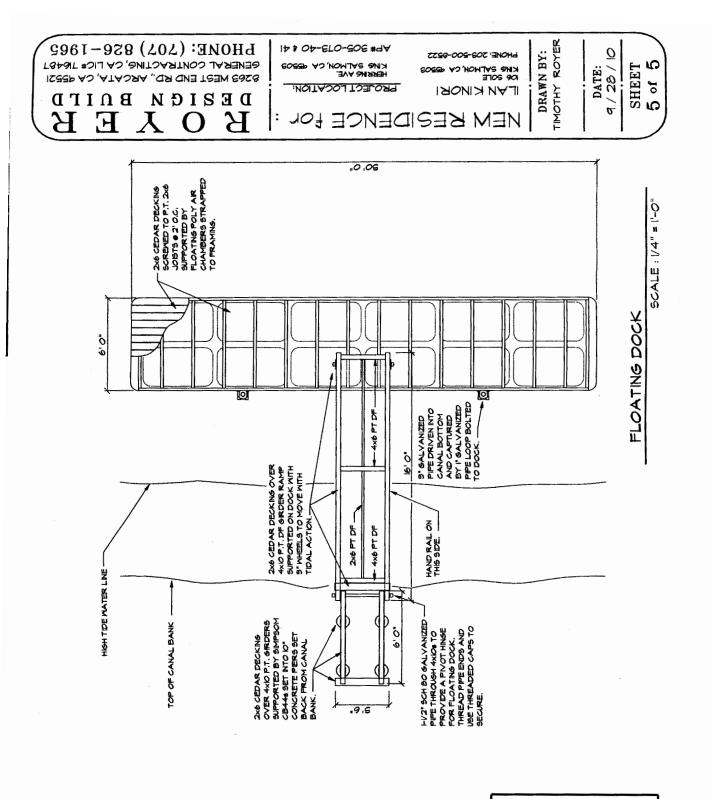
APPLICATION NO. 1-10-034 KINORI & LOBOVITS PROPOSED NEW FLOATING DOCK PLANS
